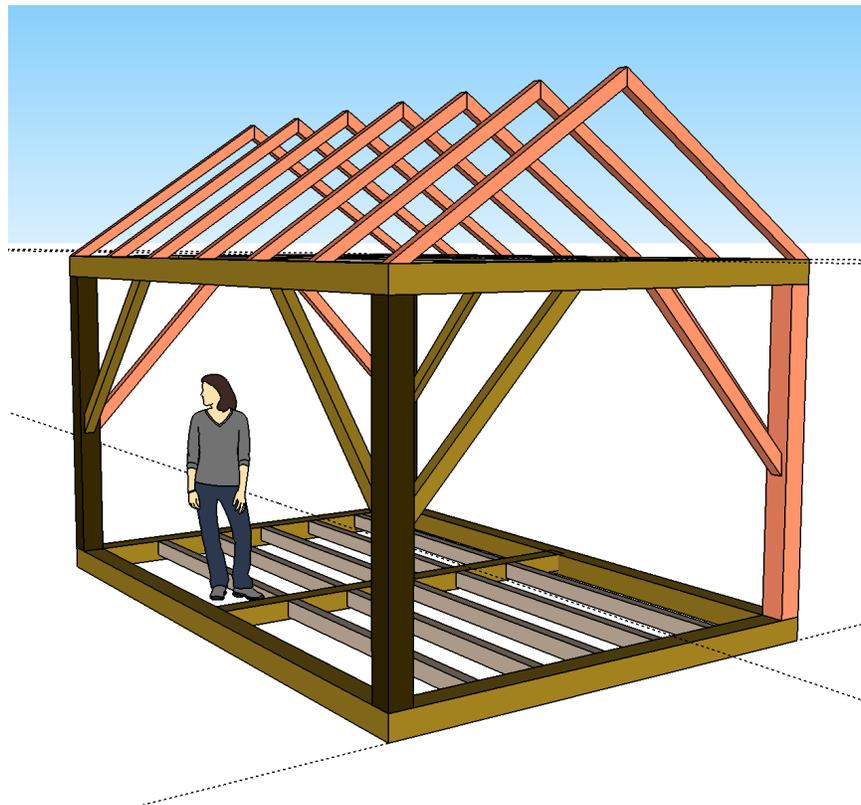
Figure A. Oldest framing on the site, origins unknown. It may have been built on site or moved to the site. The light colored elements are no longer extant.
